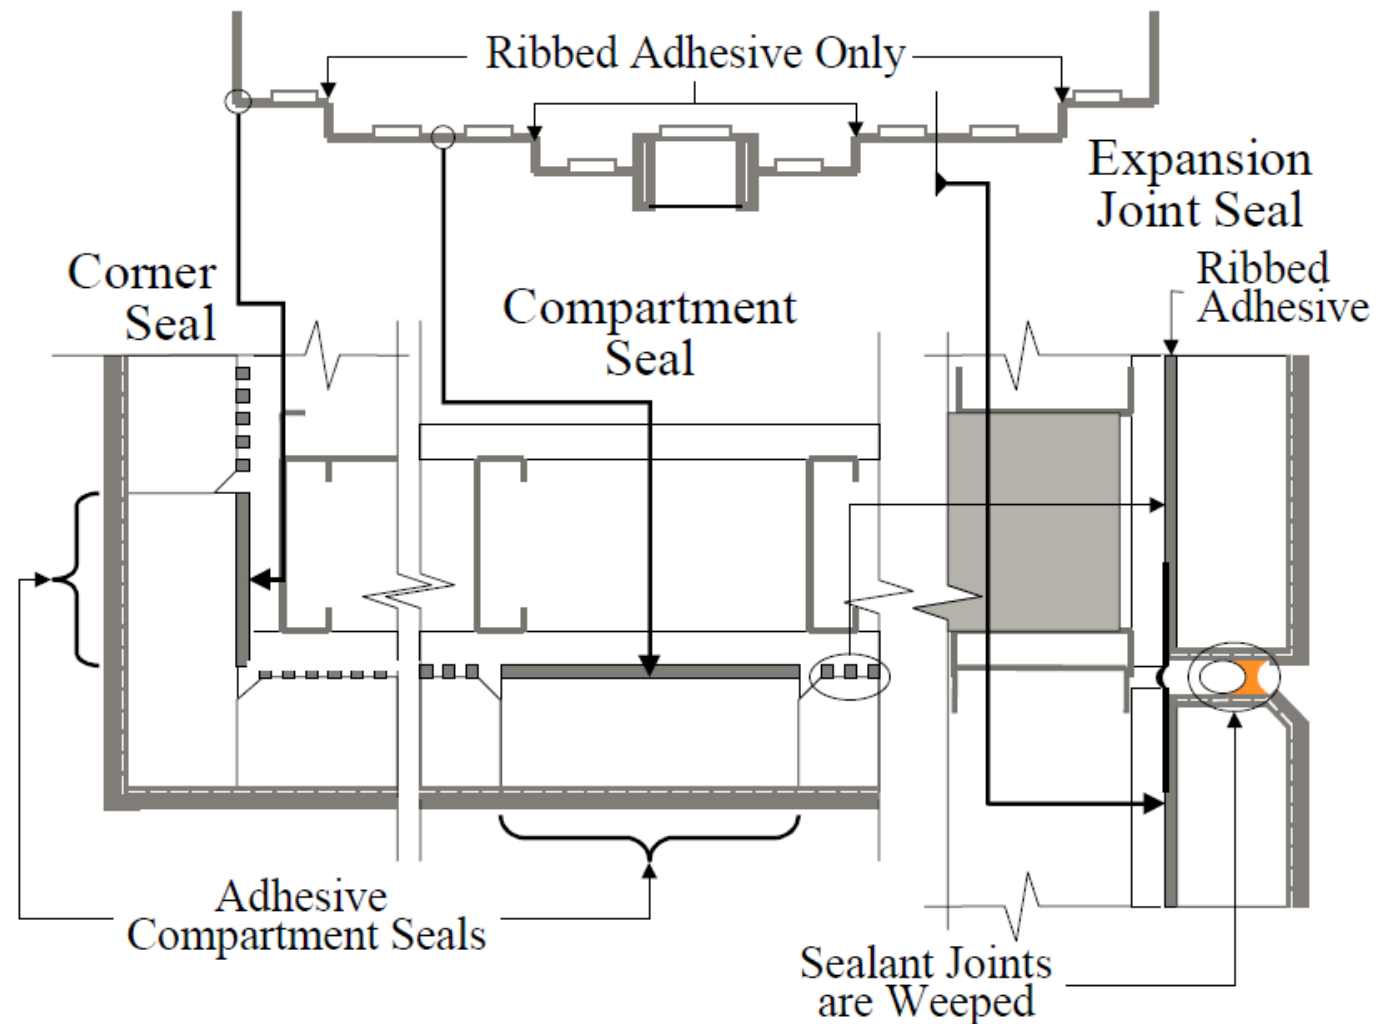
Compartment Details for Front Elevation (Shown in Plan View from Top)
